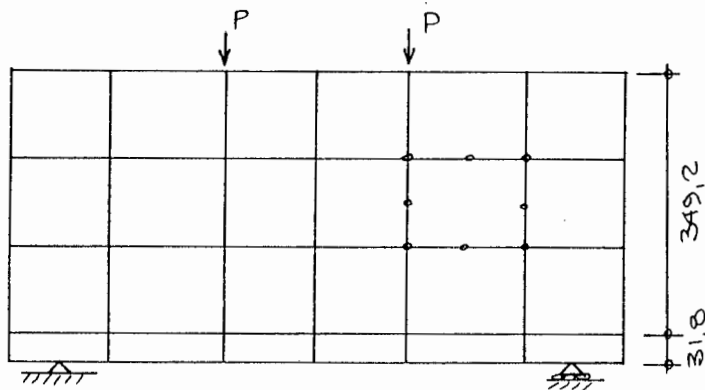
Deep Beam: Finite Element Model No.2
